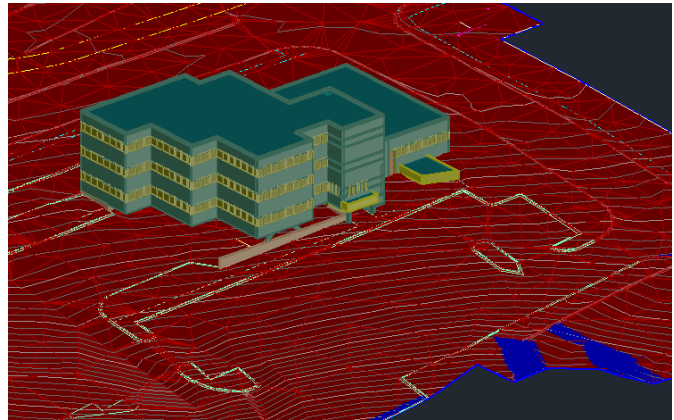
XREF OF 3D BUILDING, SHADING ON
